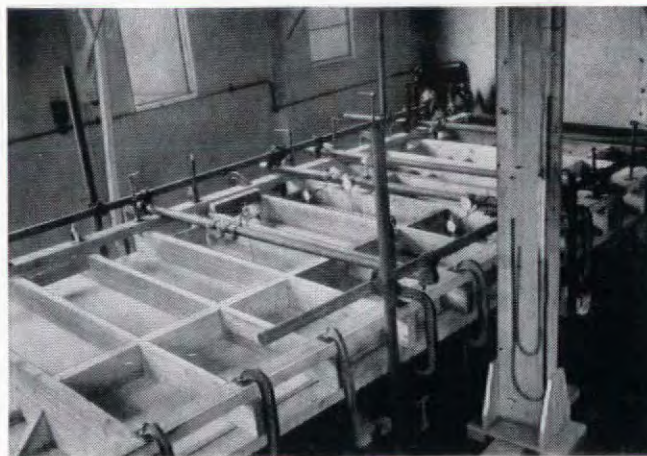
Rig for static loading tests. (Floor section is inverted, with captive airbag beneath for loading.)
